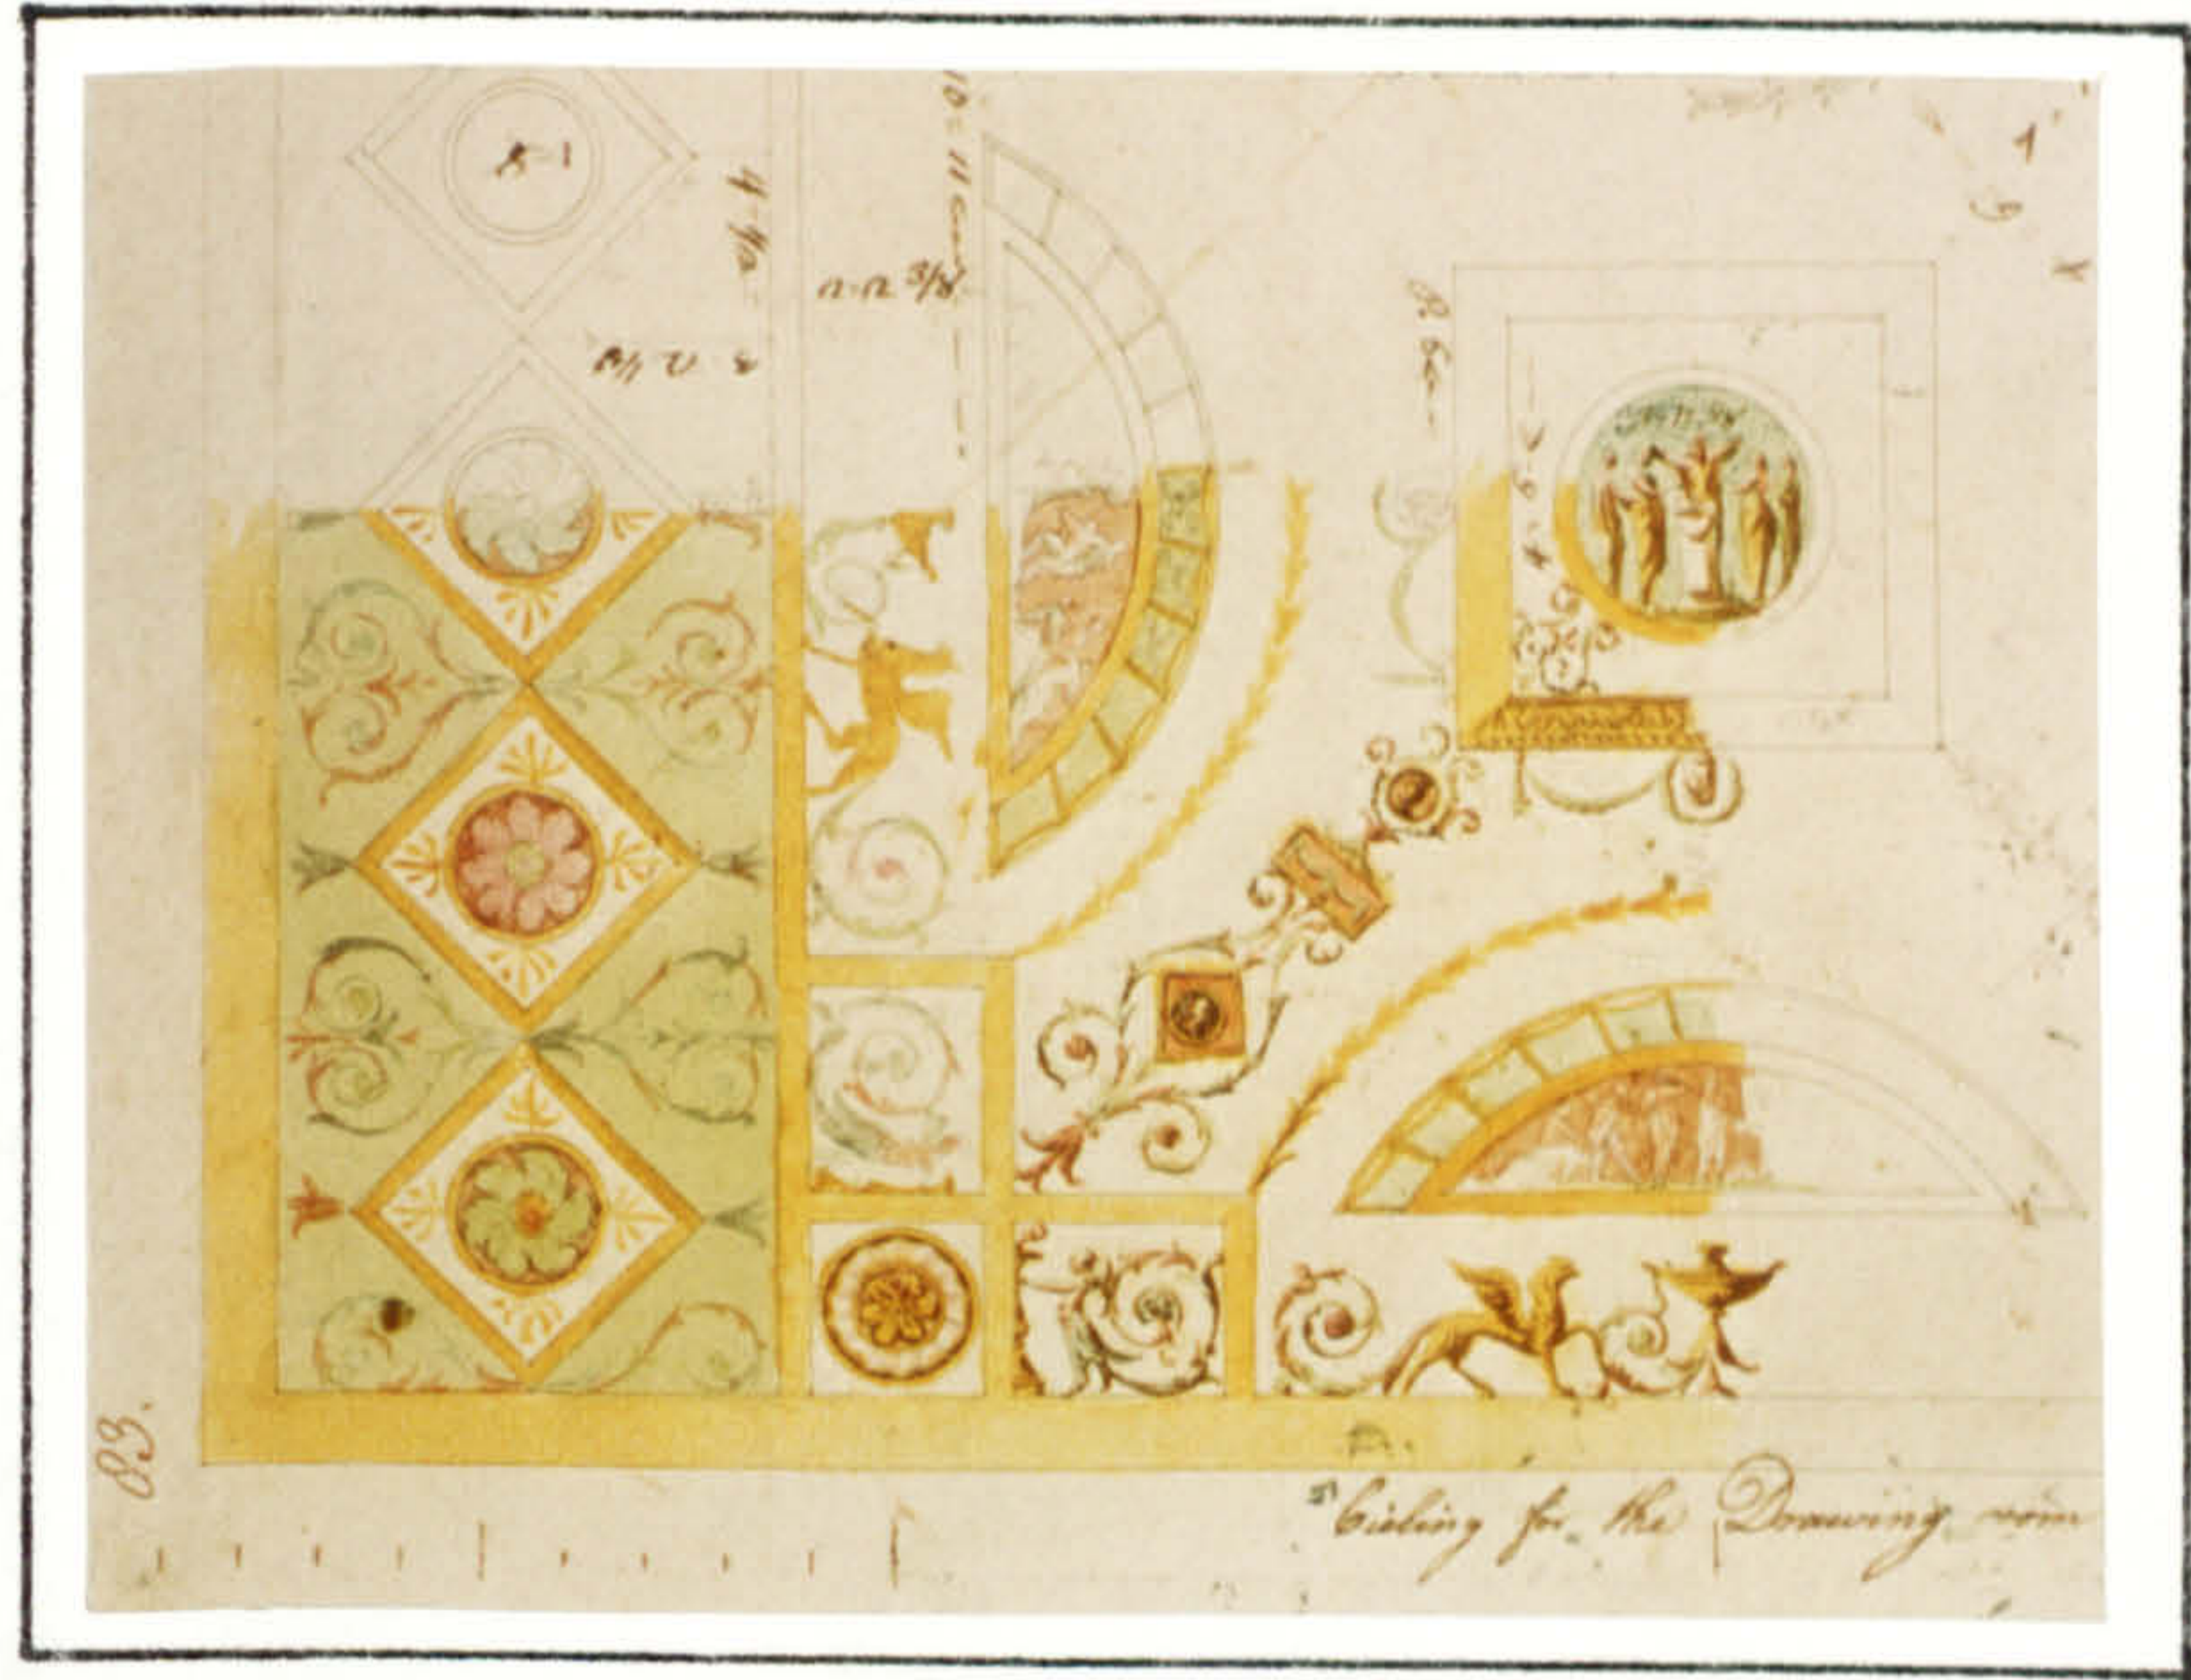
ROBERT ADAM · DESIGN FOR THE CEILING OF THE DRAWING ROOM AT SHELBURNE HOUSE · 1767
